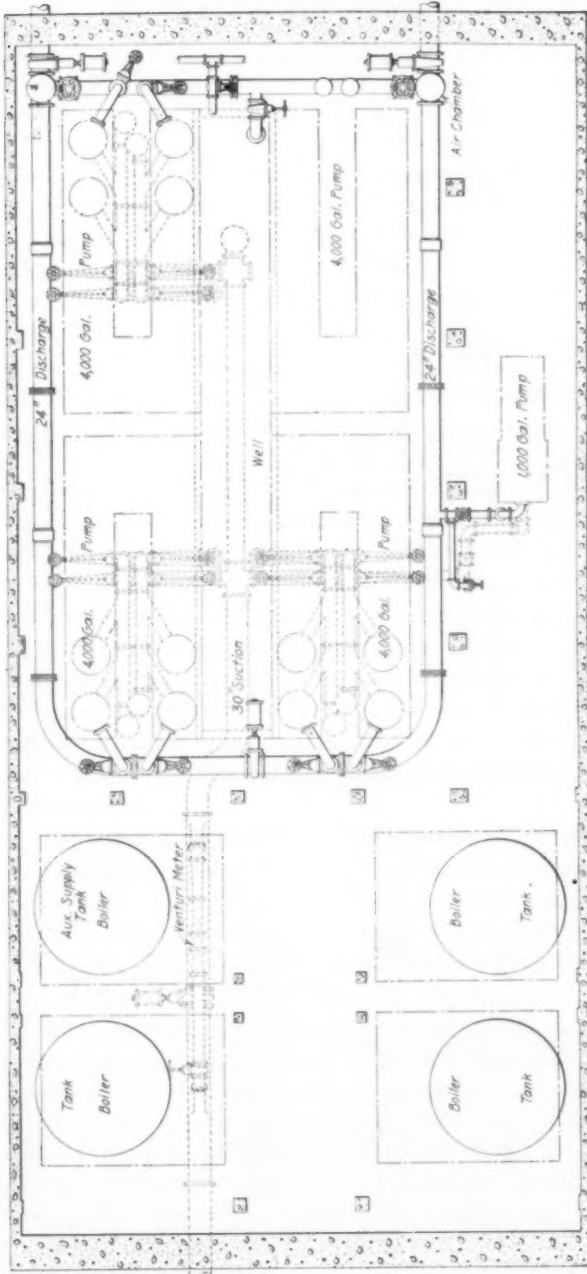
PLAN OF STATION, SHOWING WATER PIPING
